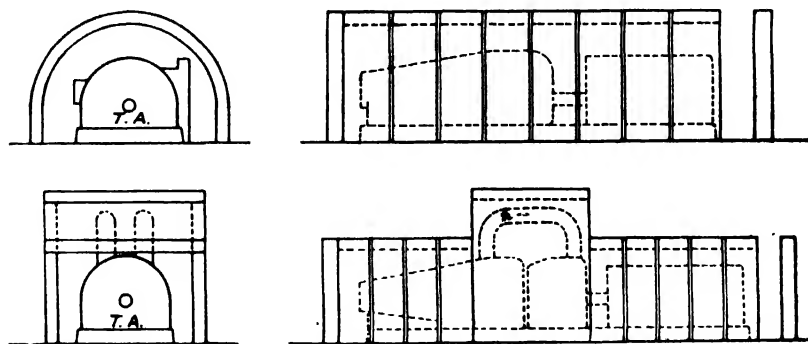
Reinforced Concrete Covers for Turbo-Alternator Protection.
